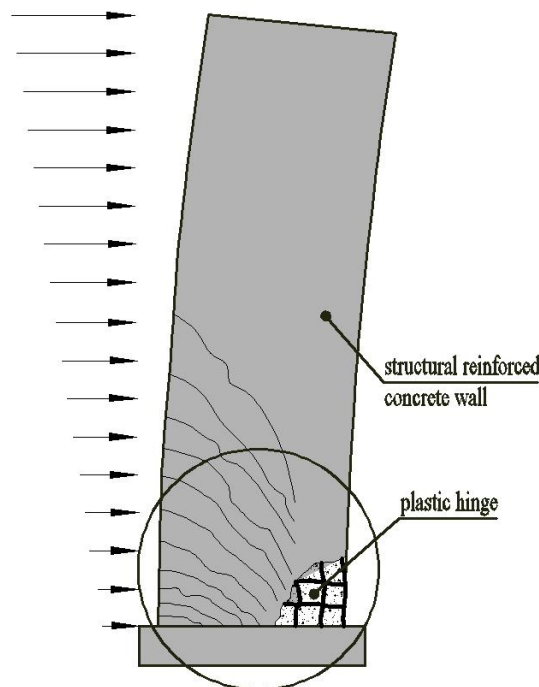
Destruction of reinforced concrete walls at horizontal seismic action.
